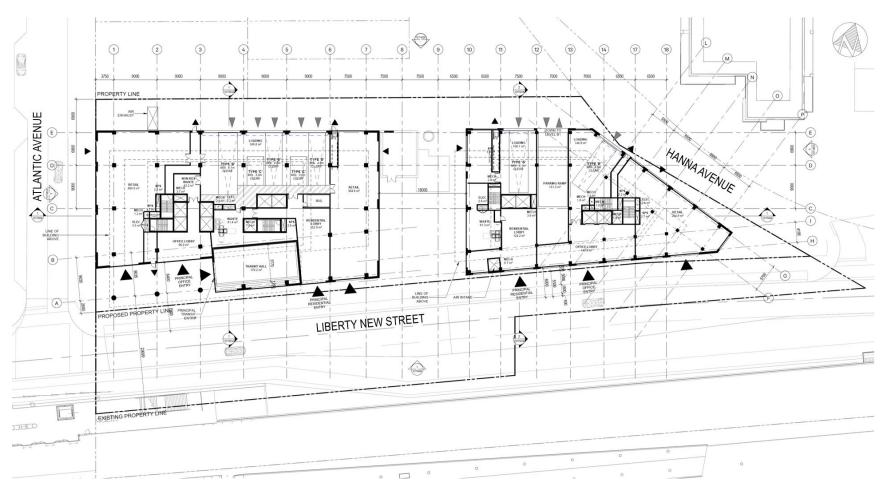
Site A (1-1A Atlantic Avenue) Site Plan
